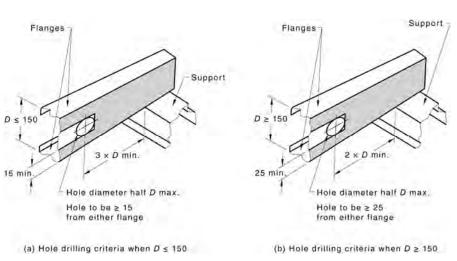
(C) Hole spacing in metal wall framework
